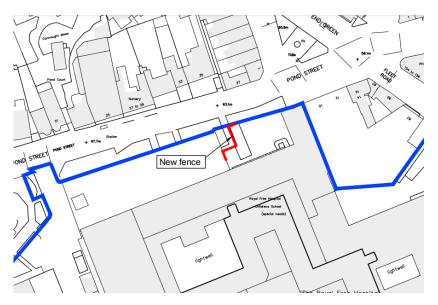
Location of new fence to enclose existing pharmacy roof plan (LGF level)
